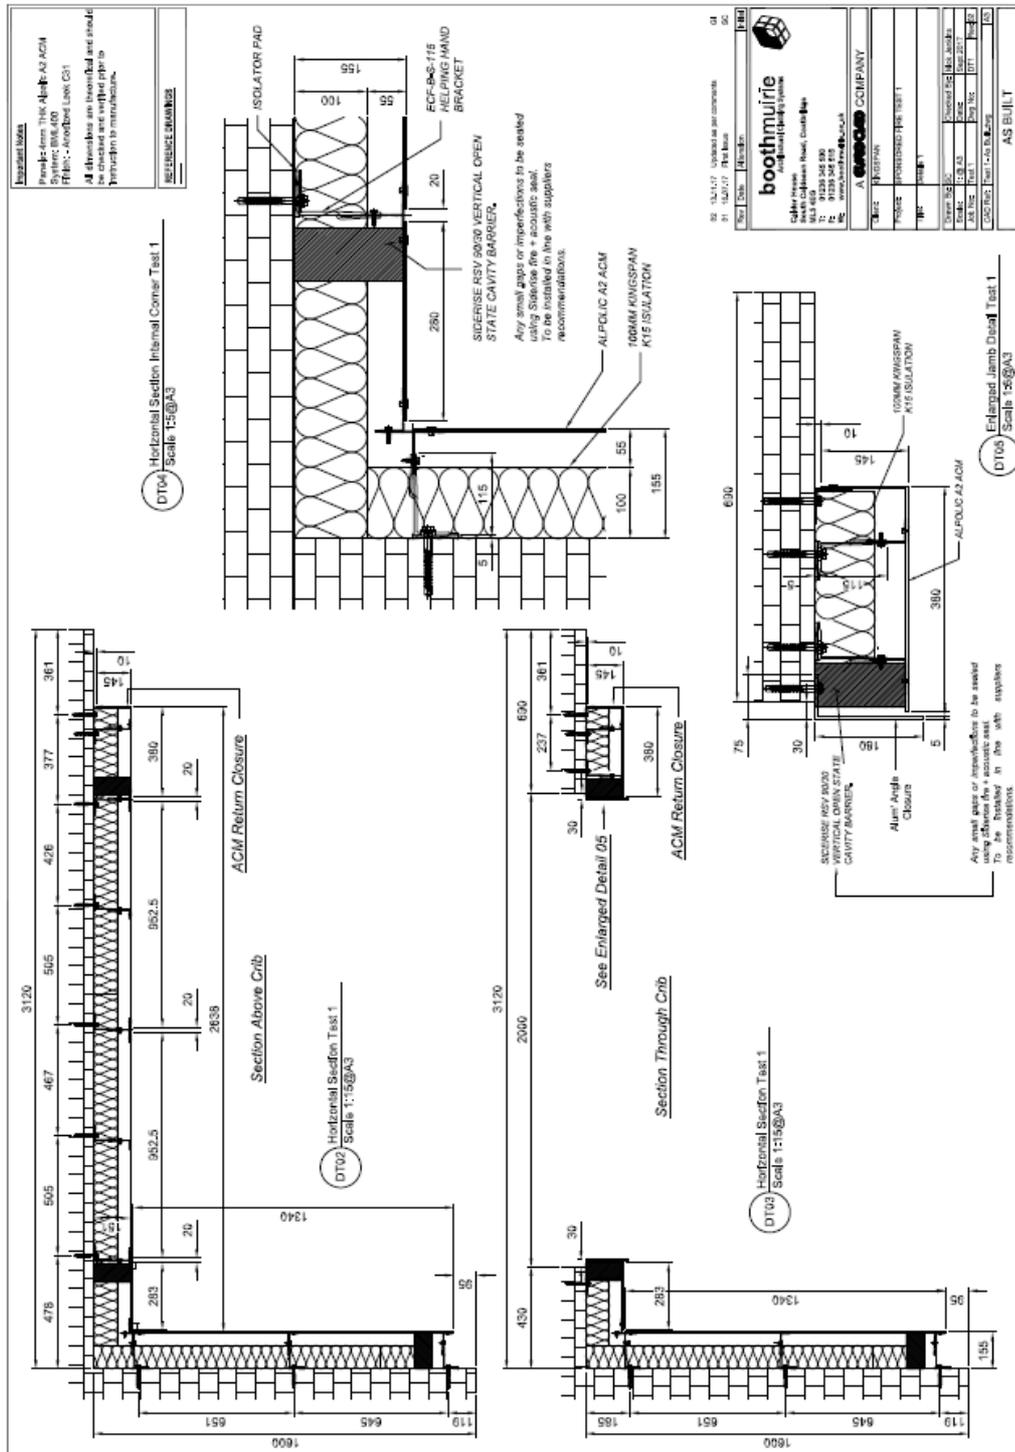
Horizontal section through and above the combustion chamber, and insulation details for tested system (supplied by the Test Sponsor).
